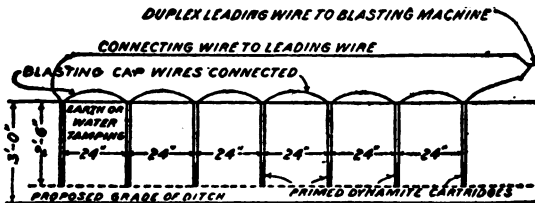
Longitudinal Section Showing Method of Loading With Electric Blasting Caps for Blasting a Ditch.
